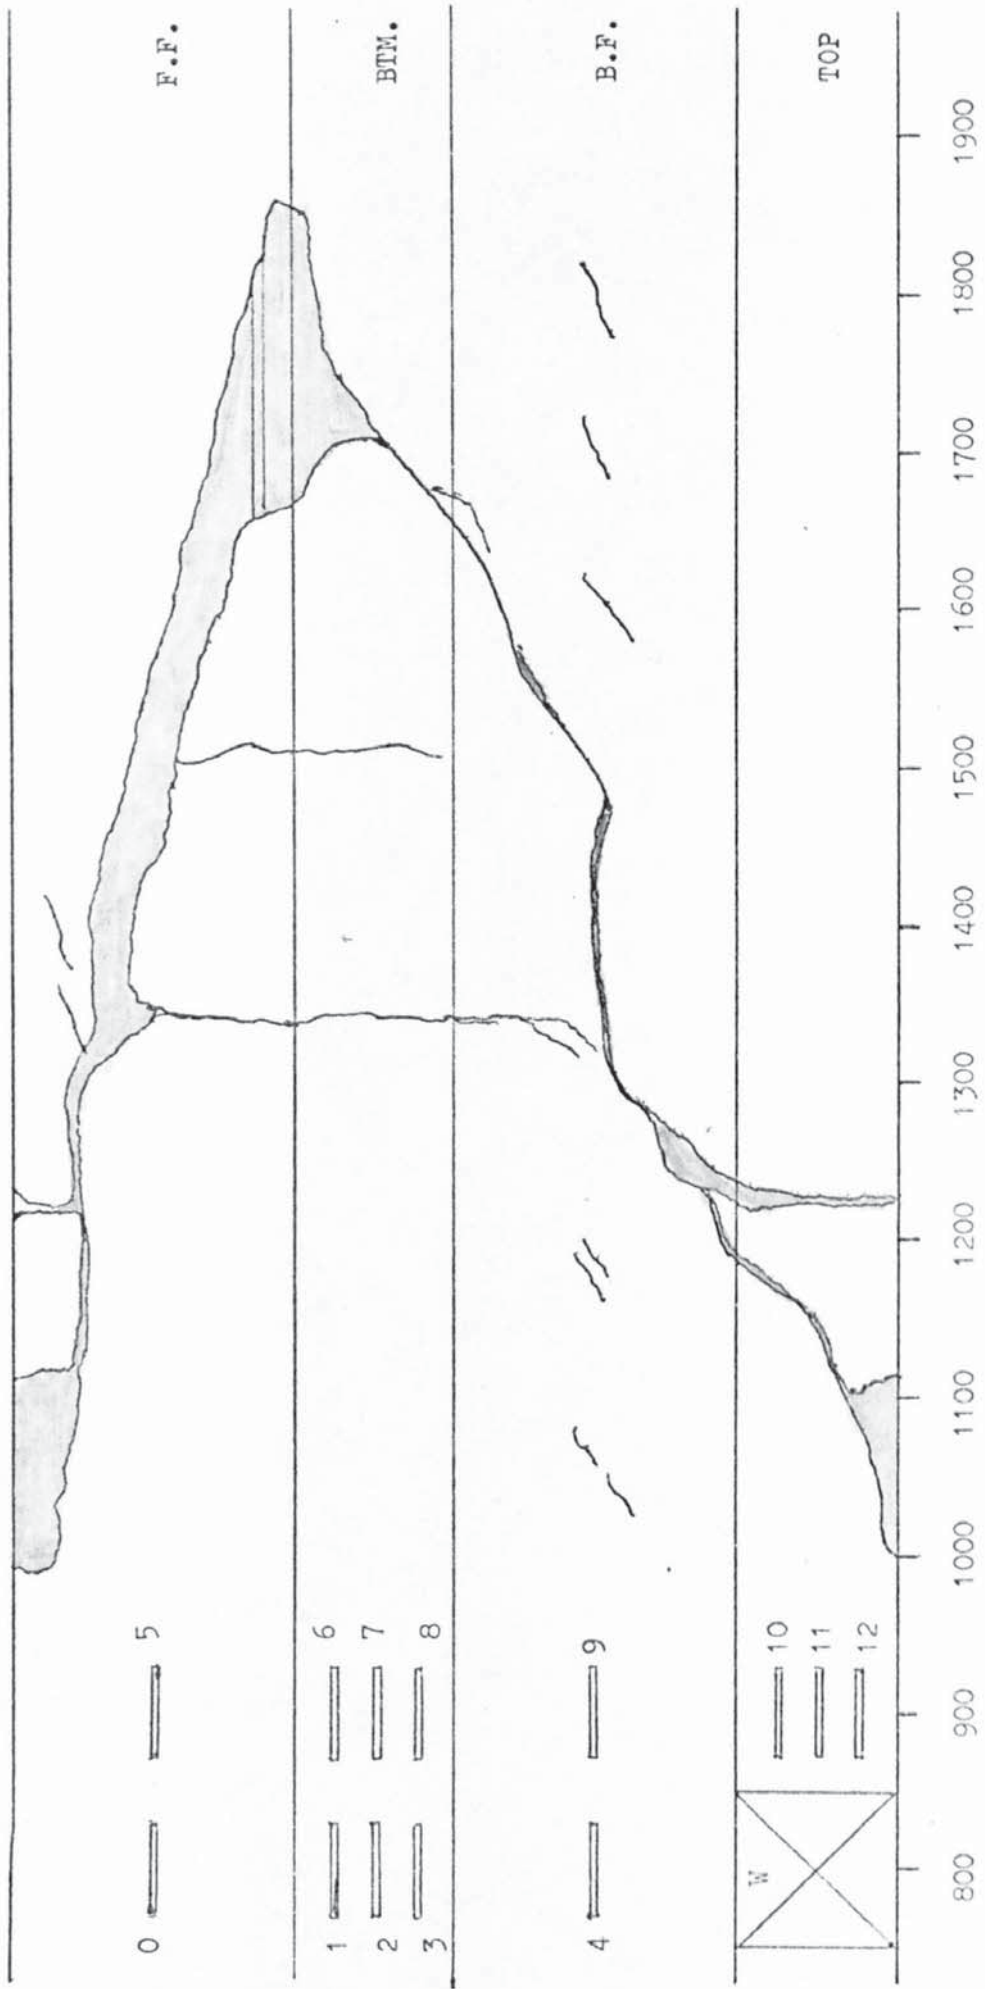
FAILURE CRACK PATTERNS - BEAM 40 ( MODE 2 )
